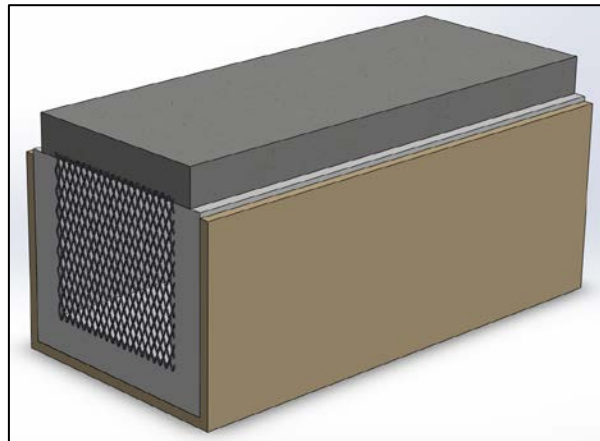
Stage 2 rock-bed section with a 75 mm thick concrete slab
